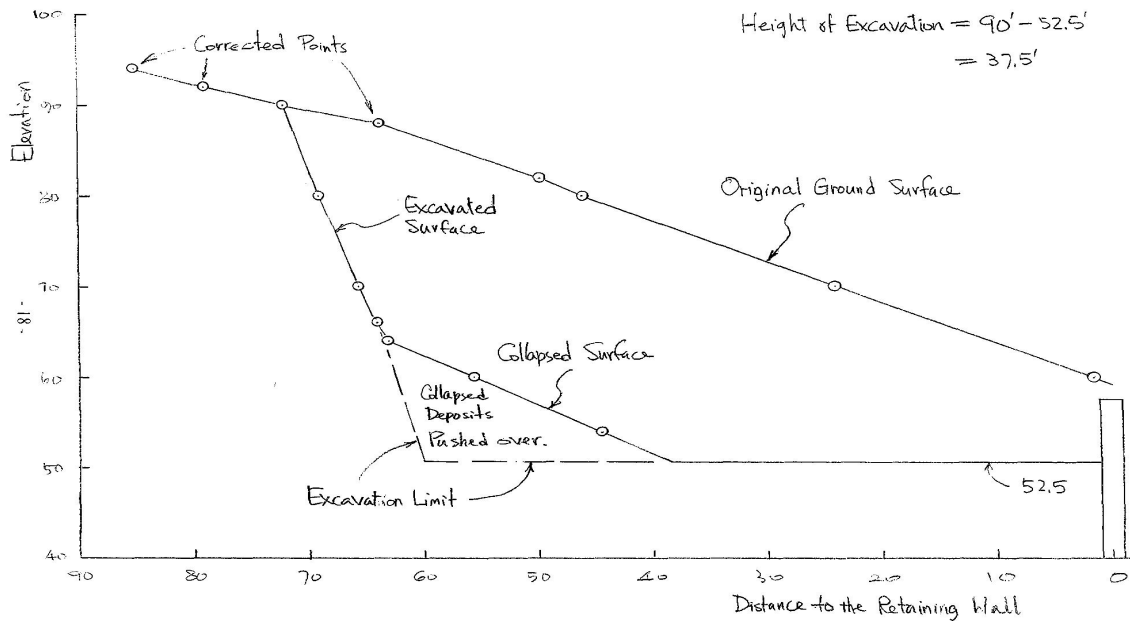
Cross Section of the Original Ground Surface, the Excavated Surface and the Failure Surface in the Collapse Area (50 feet from the turning Point of the Retaining Wall).
